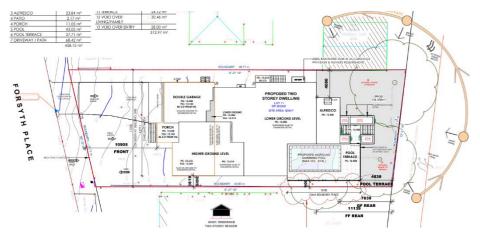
Proposed Site Plan of Site at Lot 11 of DP 263267
